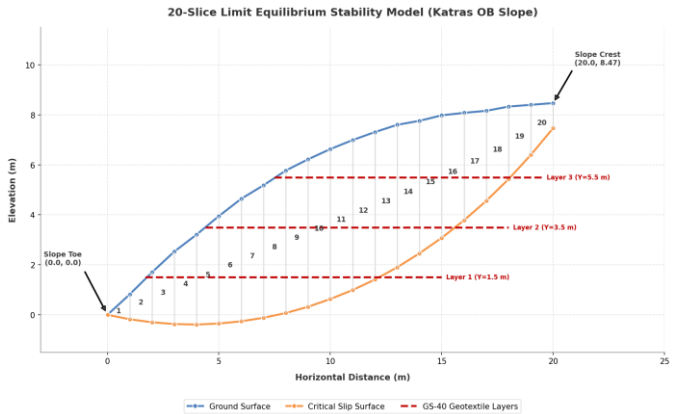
20-Slice Limit Equilibrium Method (LEM) slope geometry and GS-40 geotextile reinforcement layouts.
